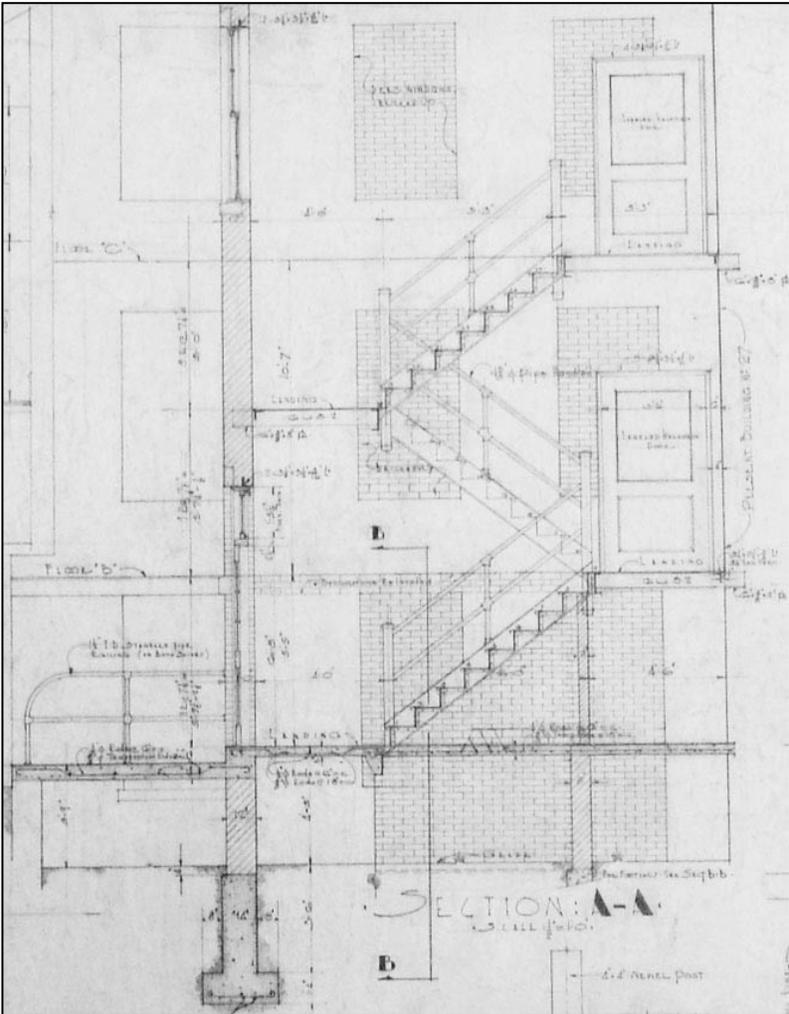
New Stair Tower, Northwest Corner of East Wing, Building #27, Hill Shops, Springfield Armory U.S.A., March 18, 1942; section detail, not to scale.
